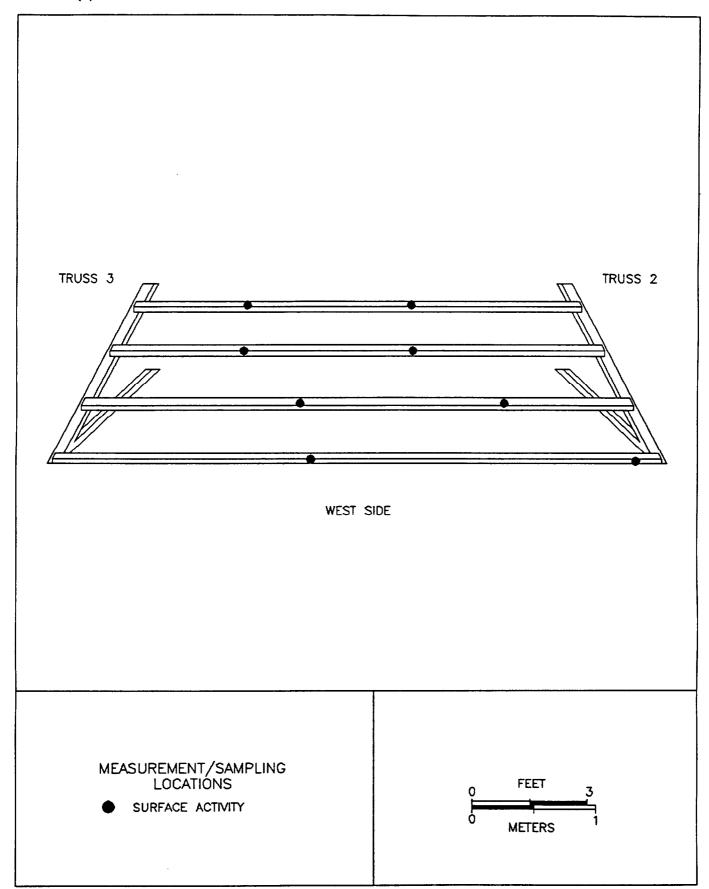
Building 8, Mezzanine, Bay 2 — Measurement and Sampling Locations
